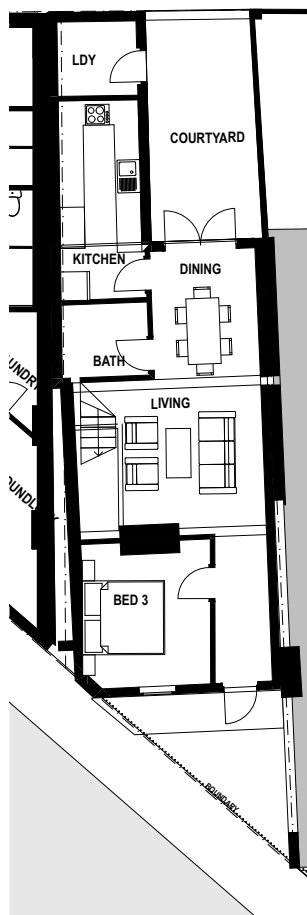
12 Nimrod Street, existing ground floor plan.
